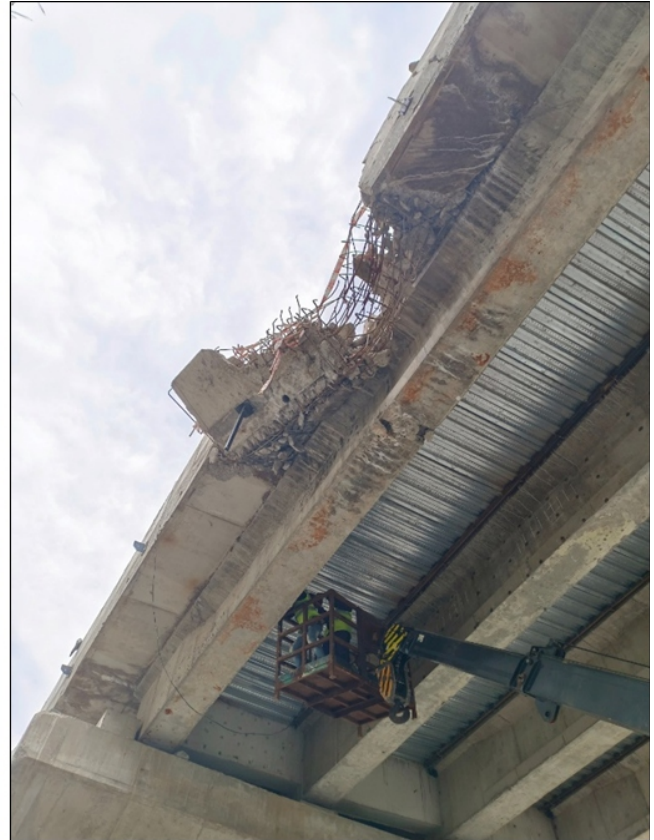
Damaged PSC girder, deck slab & crash Barrier
